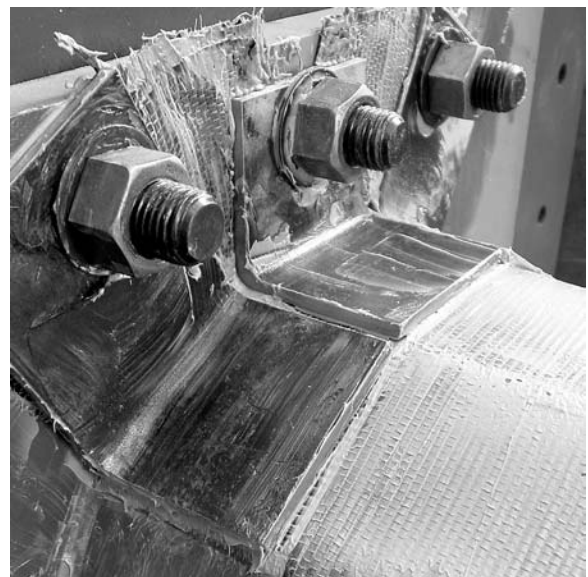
Steel angles used to mechanically anchor longitudinal CFRP plys of first monopole
